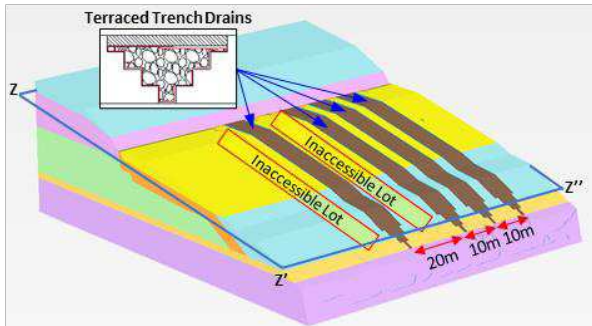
Arrangement of proposed terraced trench drain in PLAXIS 3D.
